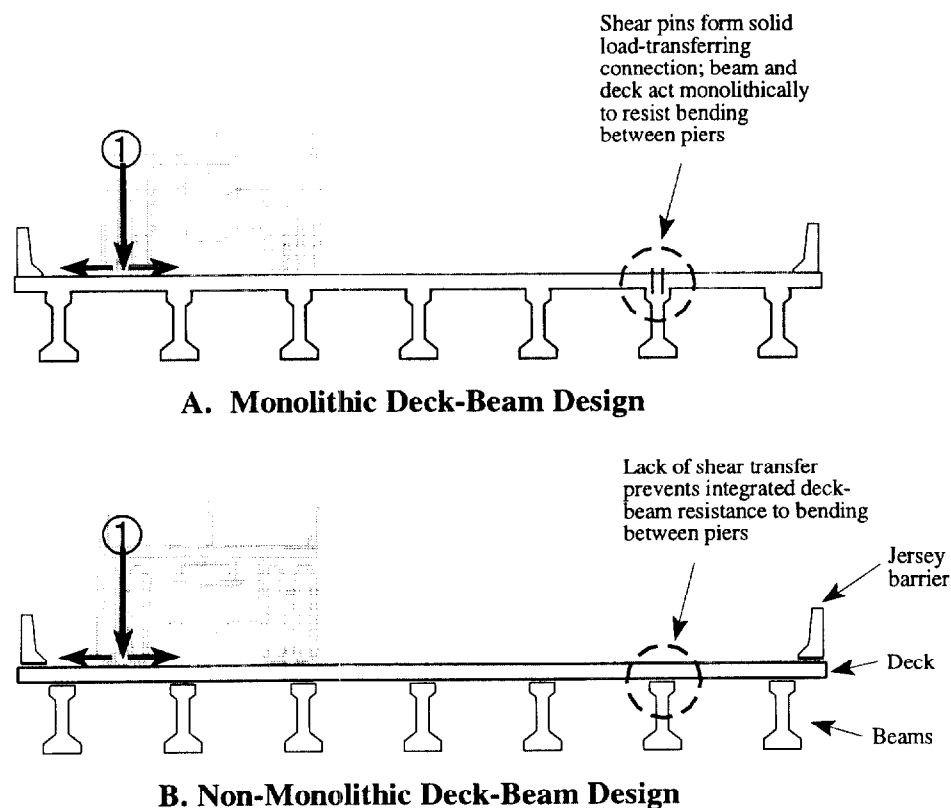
Comparison of Monolithic Deck-Beam and Nonmonolithic Deck Beam Designs
